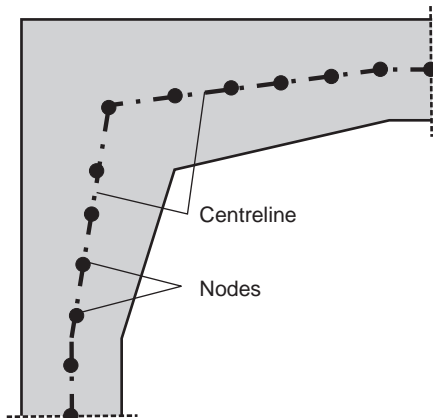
Haunched T-beam girder of a prefabricated industrial building
